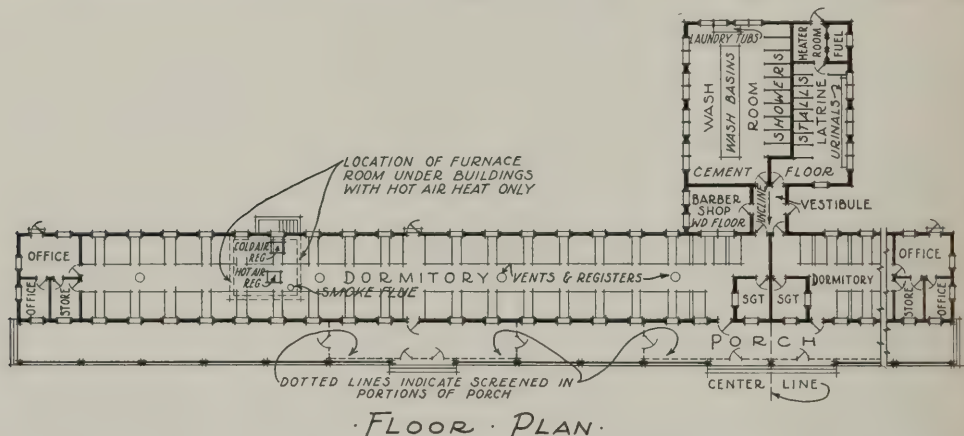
Floor plan, original aviation barrack. One story, 20 by 168 feet, with 10-foot porch in front. Planned for 140 men in two main dormitories, allowing 42 square feet of floor space and 404 cubic feet of air space per capita
